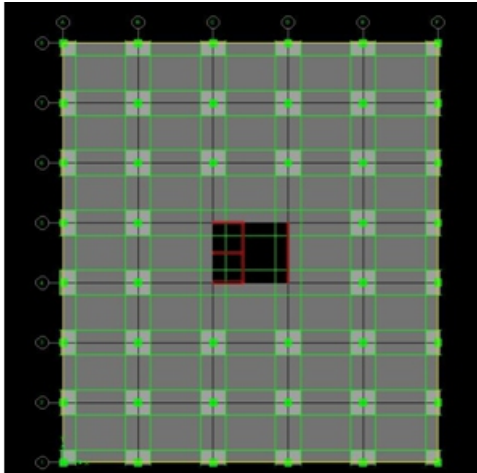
Plan of flat-slab 42 x 37.5m building
